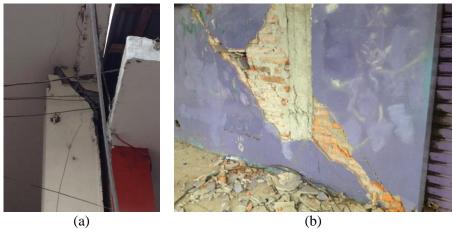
Brittle failures due to pounding (a) and interaction between RC frame and infill wall (b).
